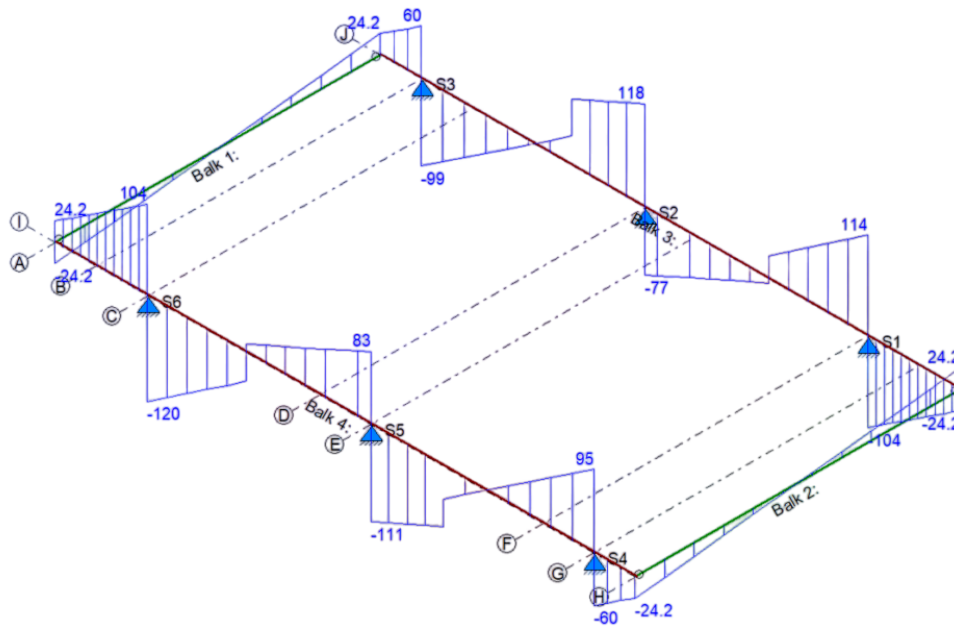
Shear forces distribution on prefab concrete foundation beams/piles
